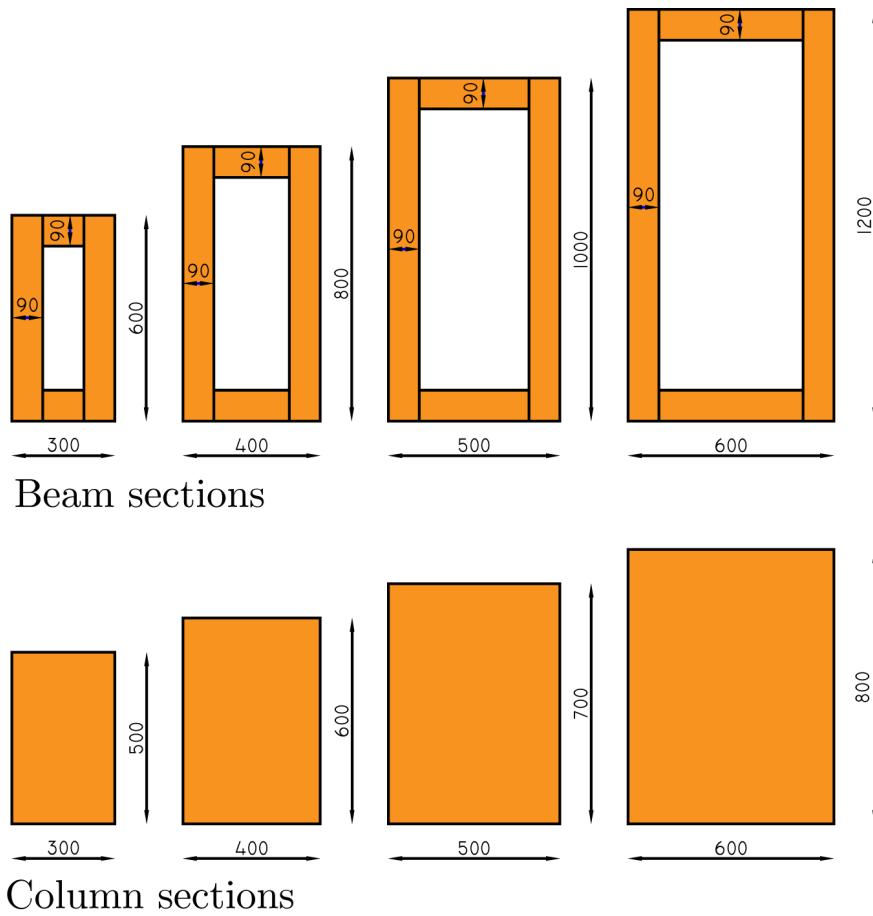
Overview of beam and column sections for use in frame parameter study
